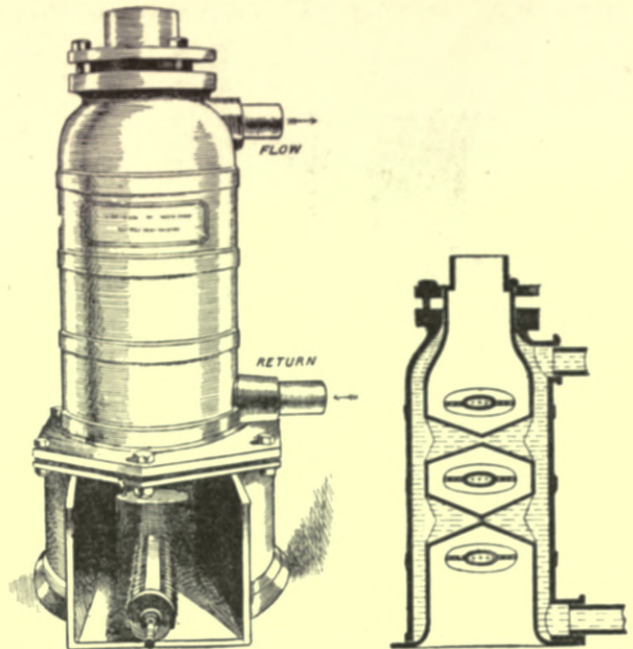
View and Section of Fletcher, Russell, & Co.'s Cross-tube Gas Boiler.
